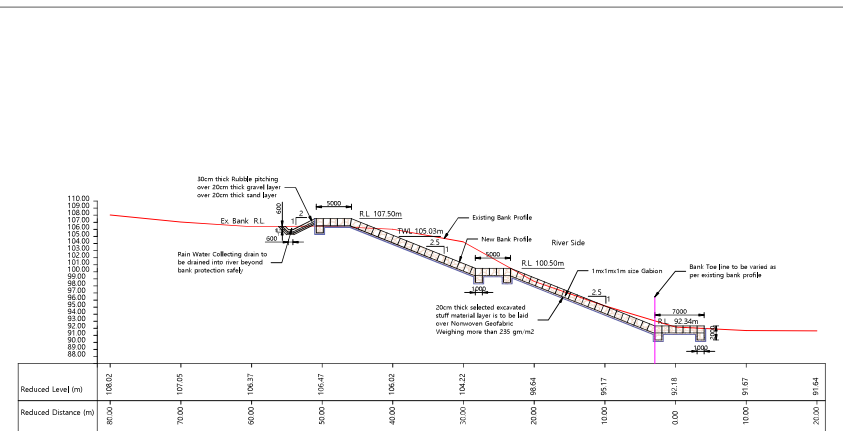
(A) TYPICAL CROSS SECTION OF HIRAPURA BARRAGE GUIDE BANK - D/S LHS @ CH. 120 m
